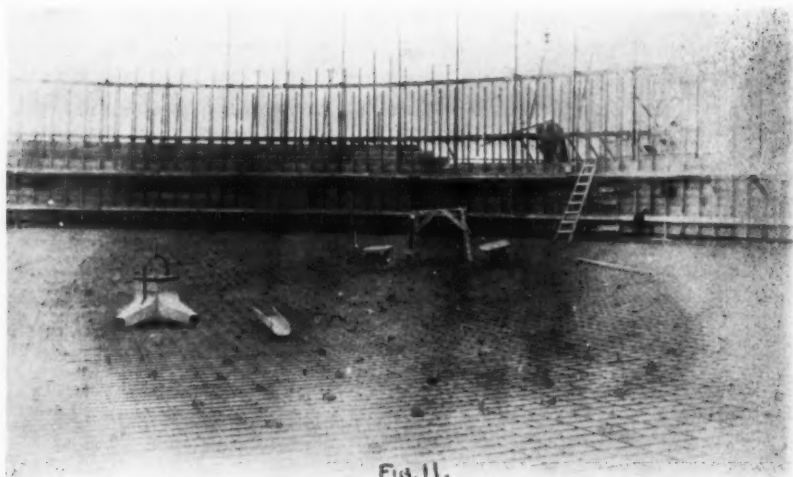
CONSTRUCTION VIEW, 4,000,000-GALLON RESERVOIR, SHOWING REINFORCING STEEL IN FLOOR
